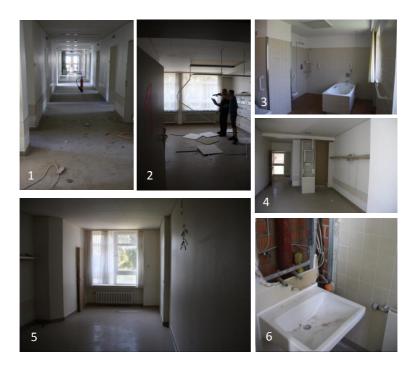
Interior view of case study building hospital St. Georg, Bad Pyrmont, 2nd floor (1: Aisle, 2: patient room (room no. 1), 3: bathing and treatment room (room no. 12), 4-5: patient rooms (room no. 3-8) with separate bath room (6)
